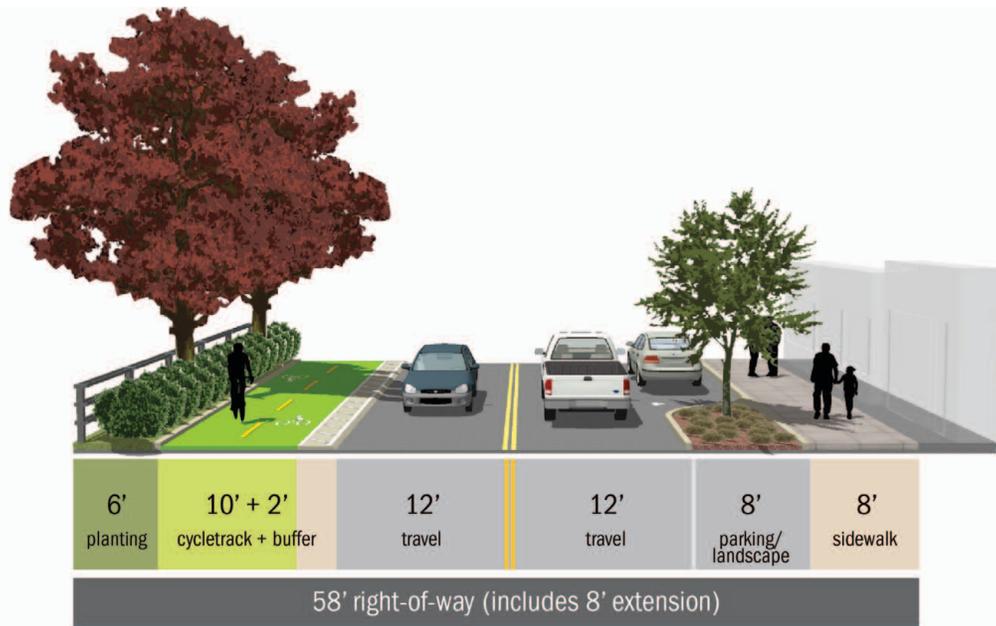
Conceptual Cross-Section for Main Street – Milport Road to Beta Street with additional right-of-way and Cycletrack
